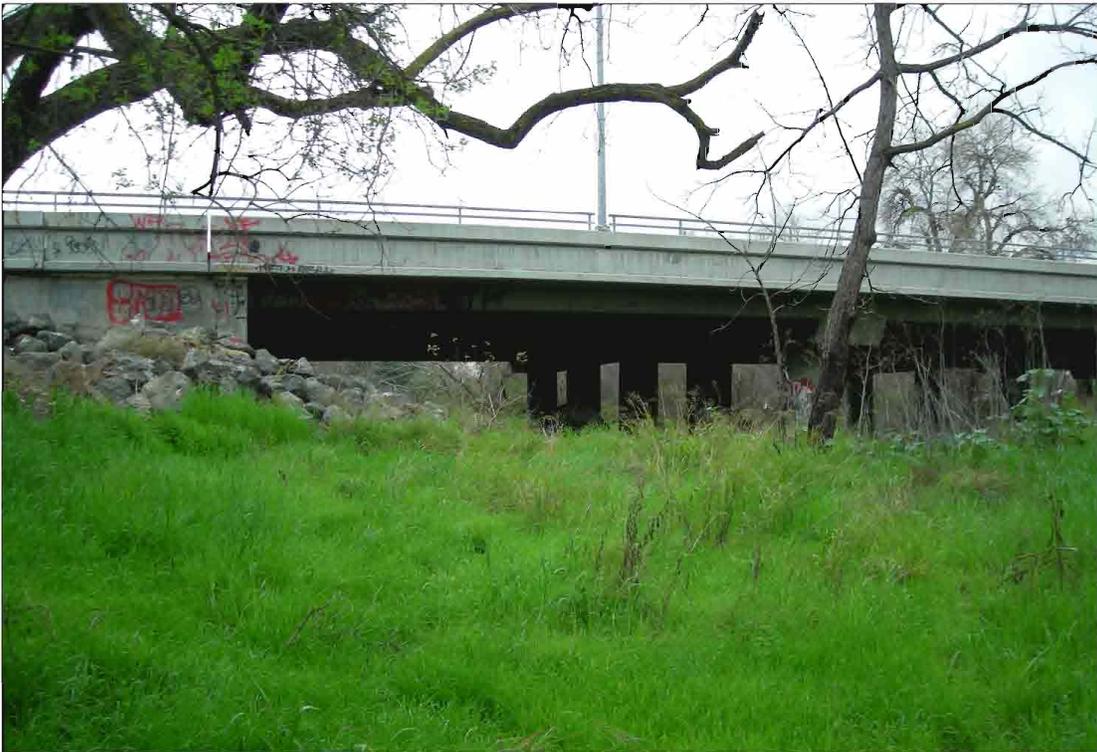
View of the Oakland Road bridge, looking west from the south side of Coyote Creek. The project includes a trail undercrossing at this location.
